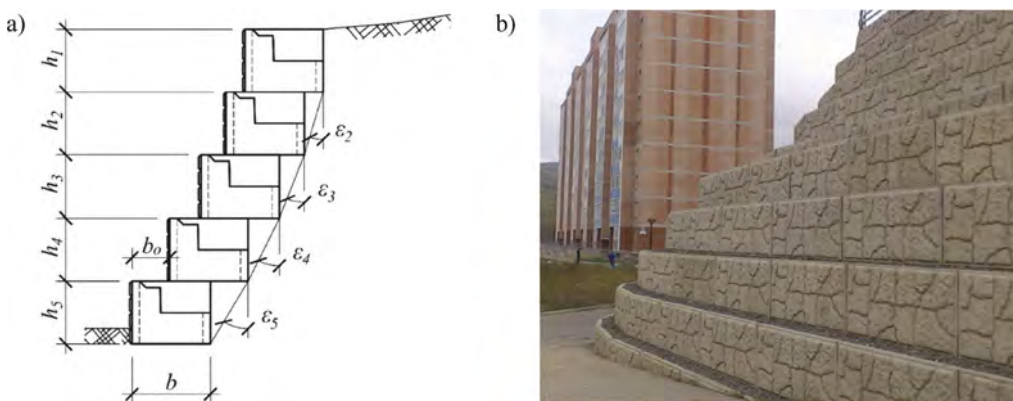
Retaining wall: a – infilled block layout scheme; b – retaining wall comprised of infilled blocks with height of up to 9 m (Vladivostok, Russia).
